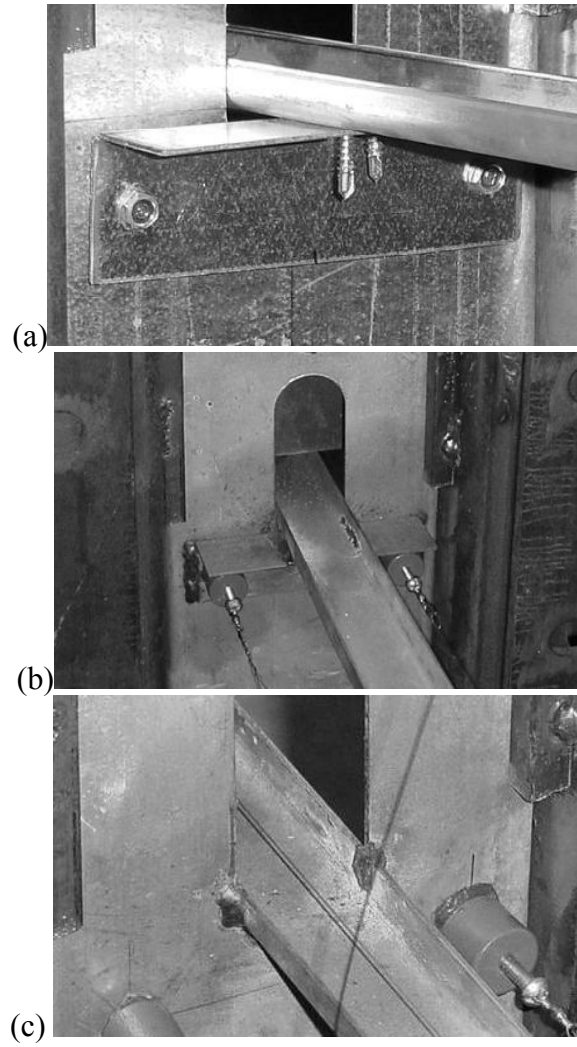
Types of Bridging Connections (a) SS (b) WW and (c) DW
